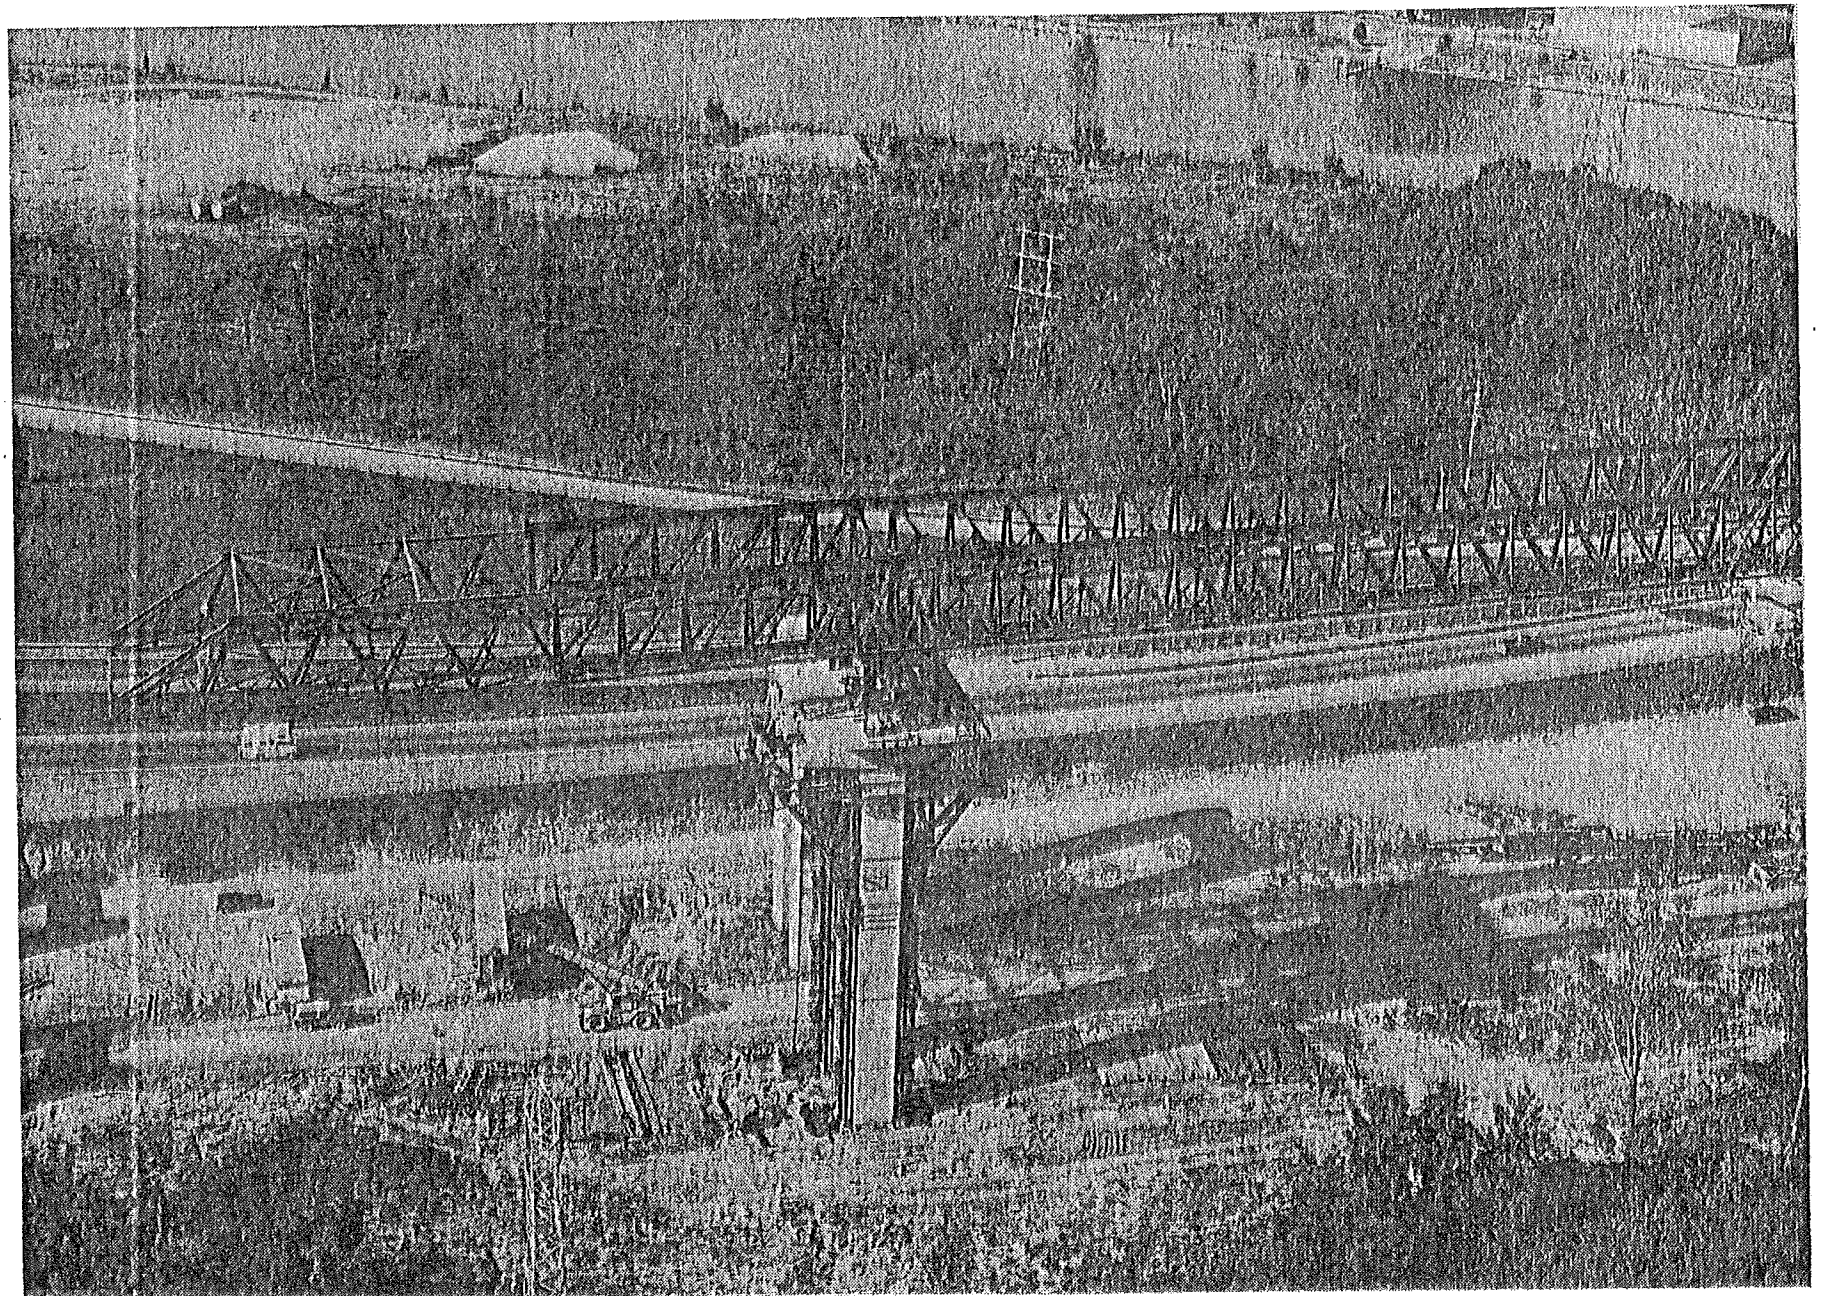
Aerial view of Launching Girder at Pier 9N
